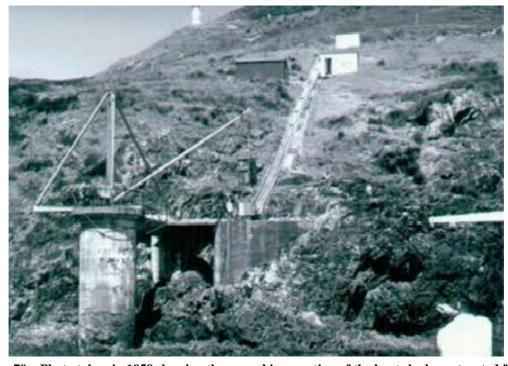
Photo taken in 1958 showing the second incarnation of the boat shed constructed from corrugated iron. The stores shed, with the door open and the engine shed above.
